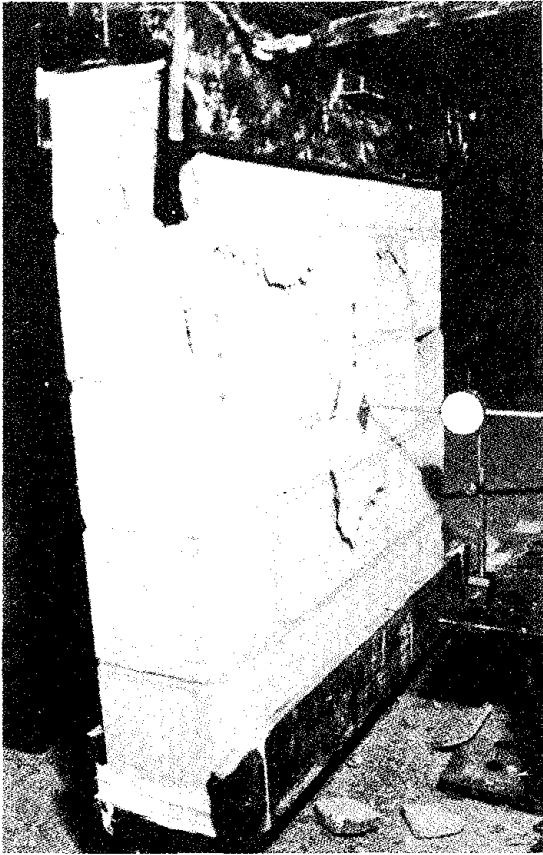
Short Wall Specimens With and Without Joint Reinforcement After Failure
